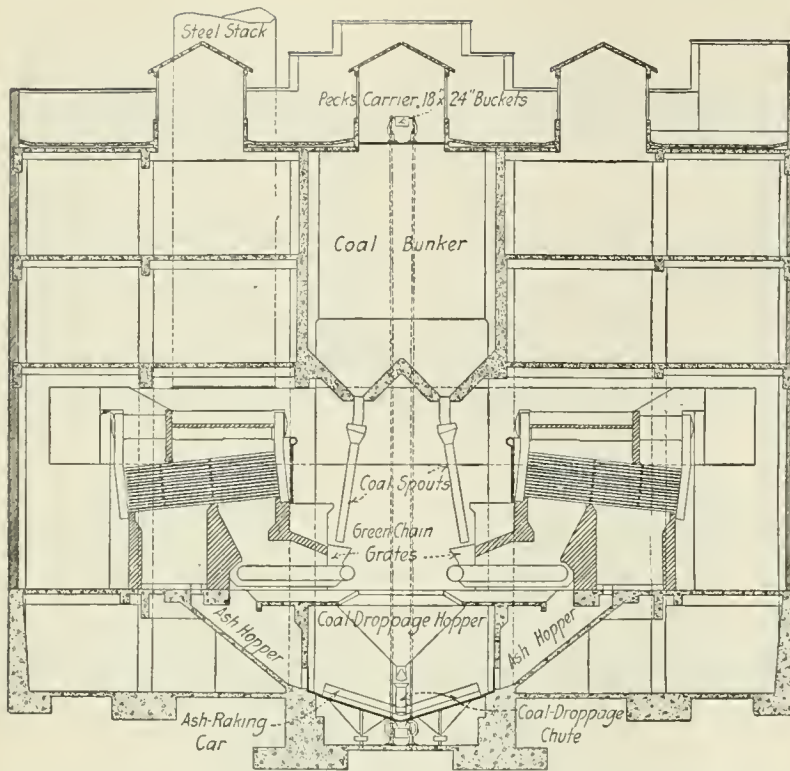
CROSS-SECTION OF BOILER ROOM WITH PECK CARRIER
